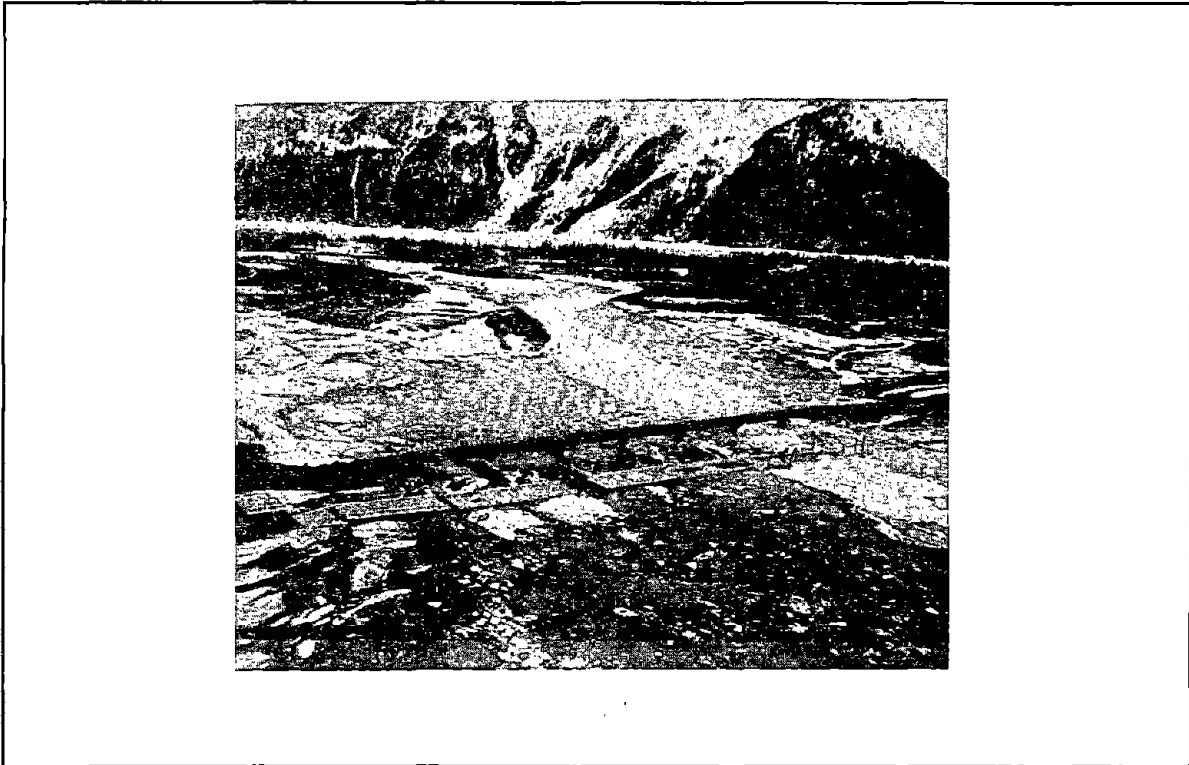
Damaged Railroad and Highway Bridges across the Twenty-Mile River.
